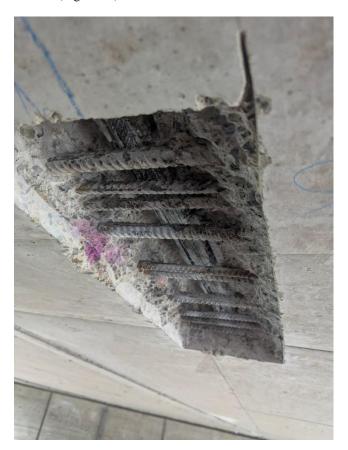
Sampling of prestressing wires from an existing road bridge for material testing (source: LS Brandenburg).
